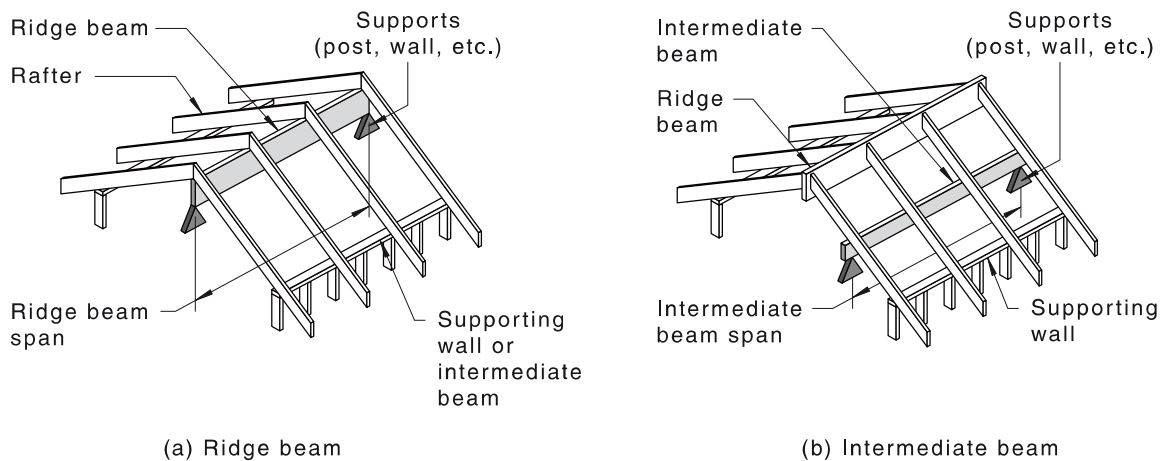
ROOF BEAMS—RIDGE OR INTERMEDIATE BEAM
